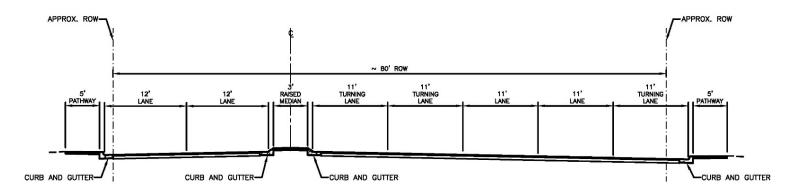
36th Avenue looking east from the west side of the Seward Highway intersection
